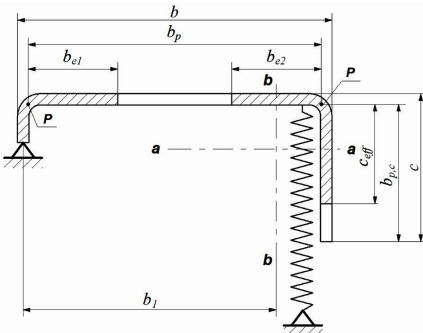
Plane section element (flange) stiffened by the single edge fold (flange width b should not exceed $60t$, t is profile thickness)
